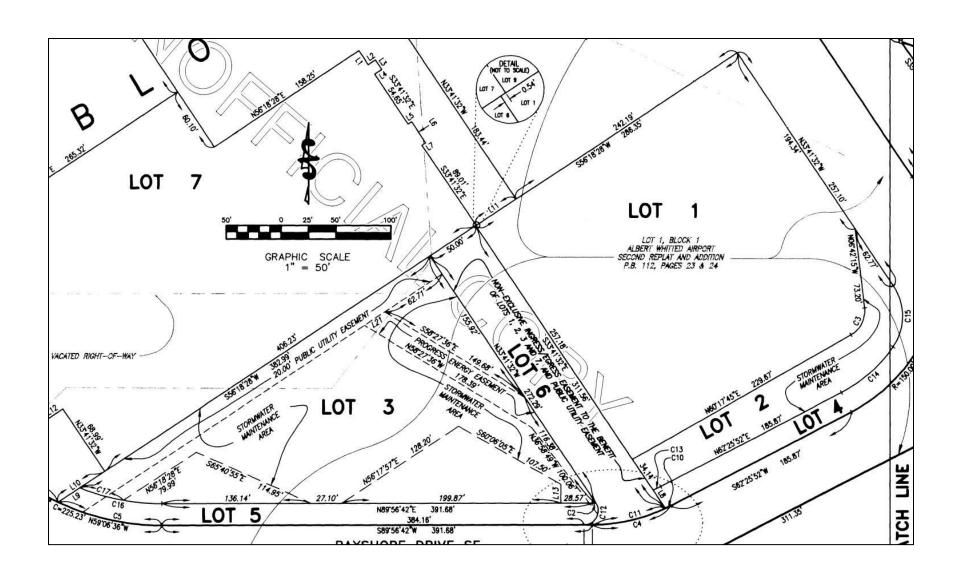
EXHIBIT B DIAGRAM OF PROPOSED EXPANSION
